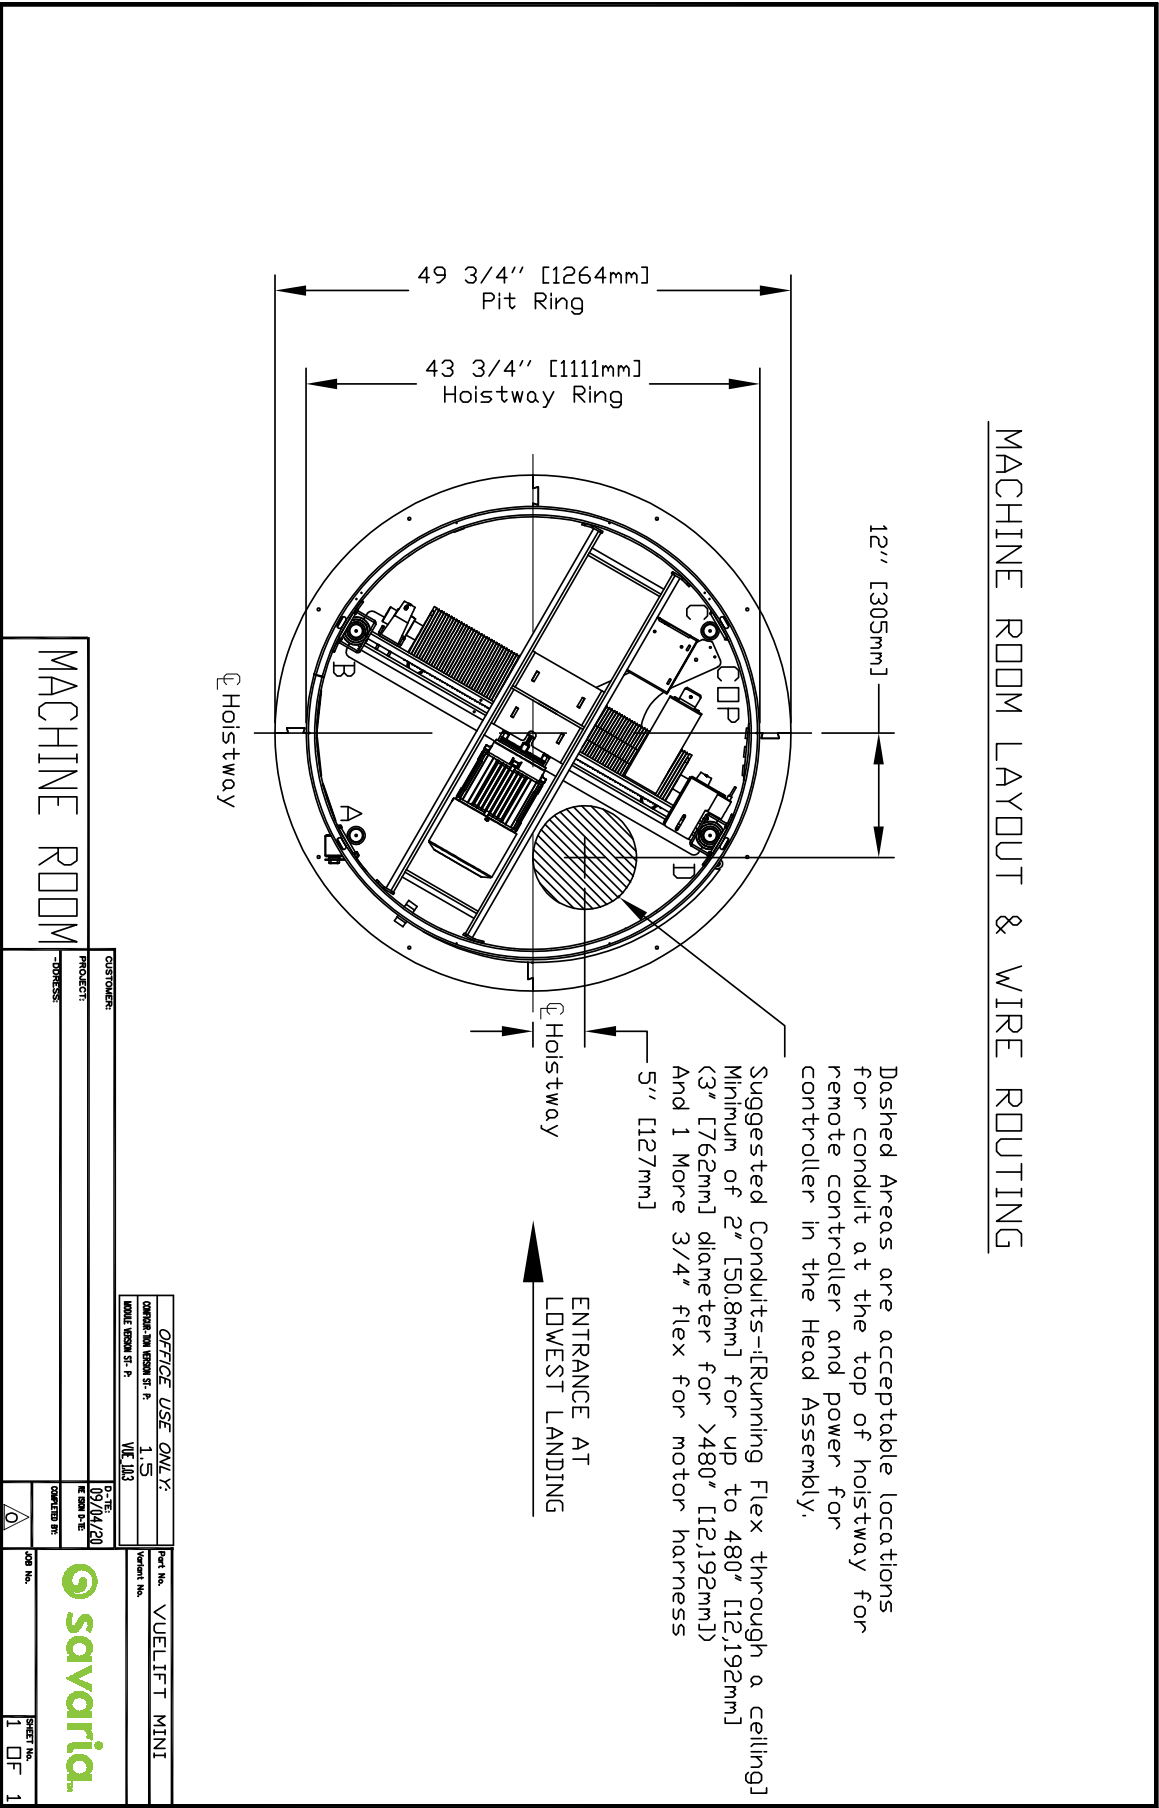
Machine room layout and wire routing (acrylic) - type 1 or 2
